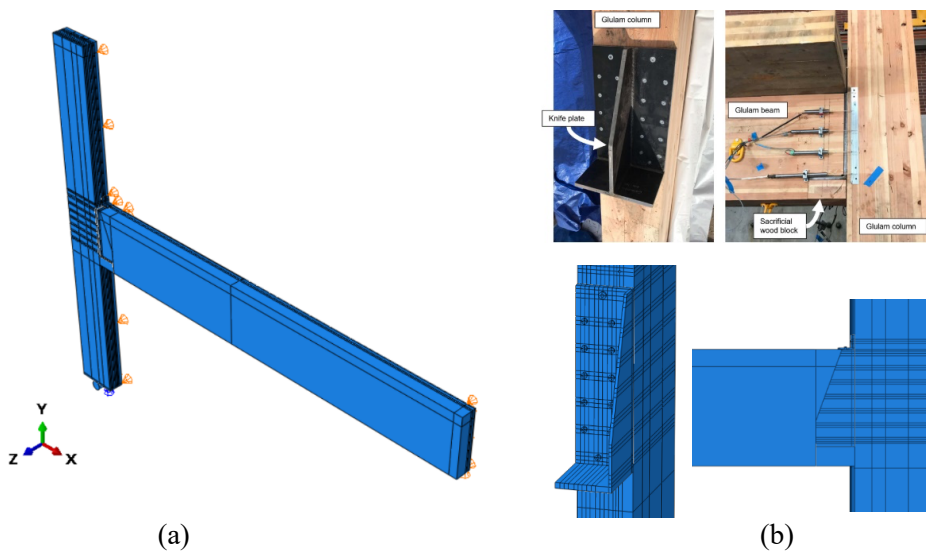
Finite element model for the BTC connection: (a) 3D view; (b) knife plate and assembled connection described in [3,4]. Half of the connection has been modelled due to symmetric boundary conditions.
